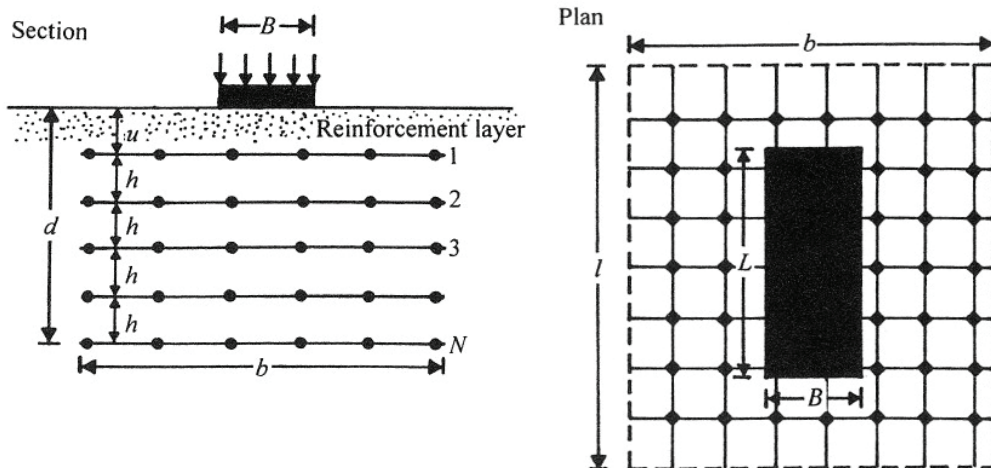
Geometric parameters of a rectangular foundation supported by reinforced soil
